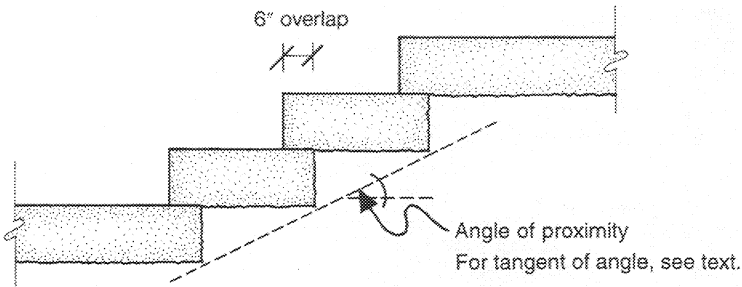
Recommended angle of proximity for stepped footings.
